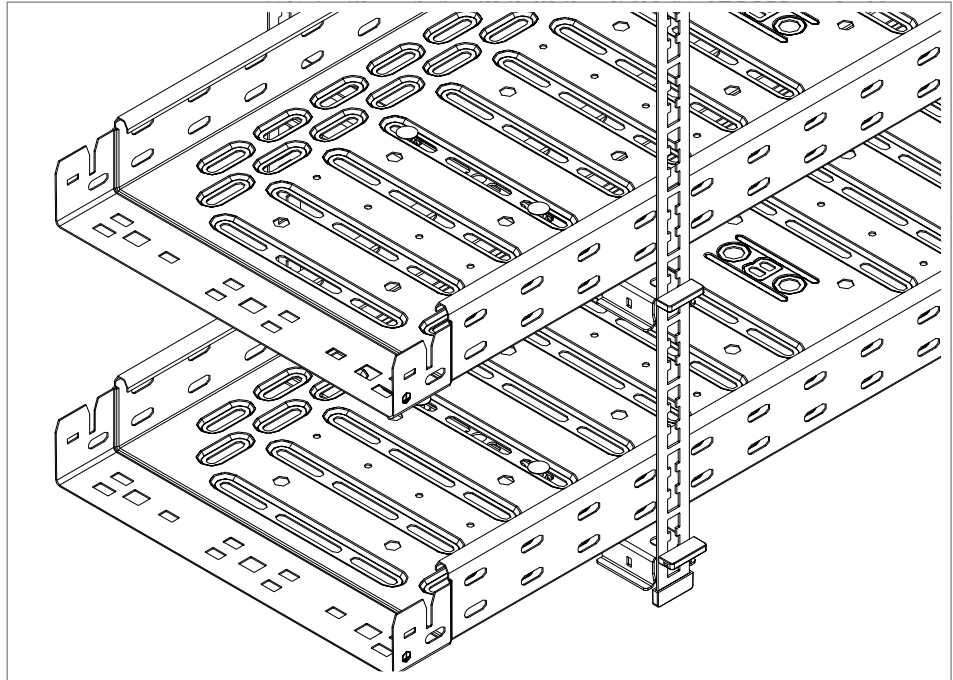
Fit multiple components to suspension strips, e.g. additional cable trays
